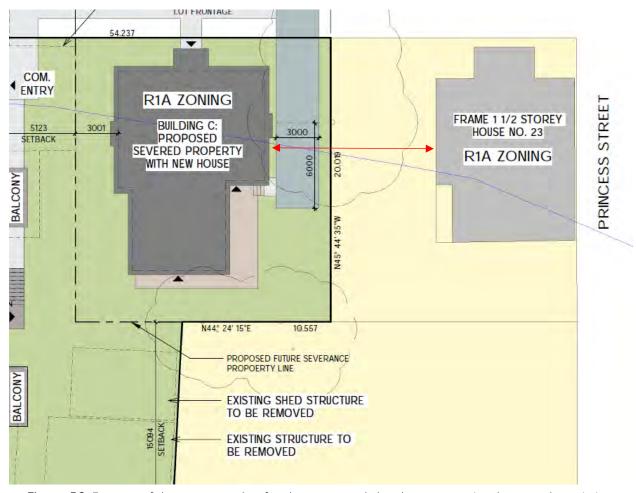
Excerpt of the concept plan for the proposed development as it relates to the existing stone building on-site (Source: Fryett Turner Architects, 2023).
